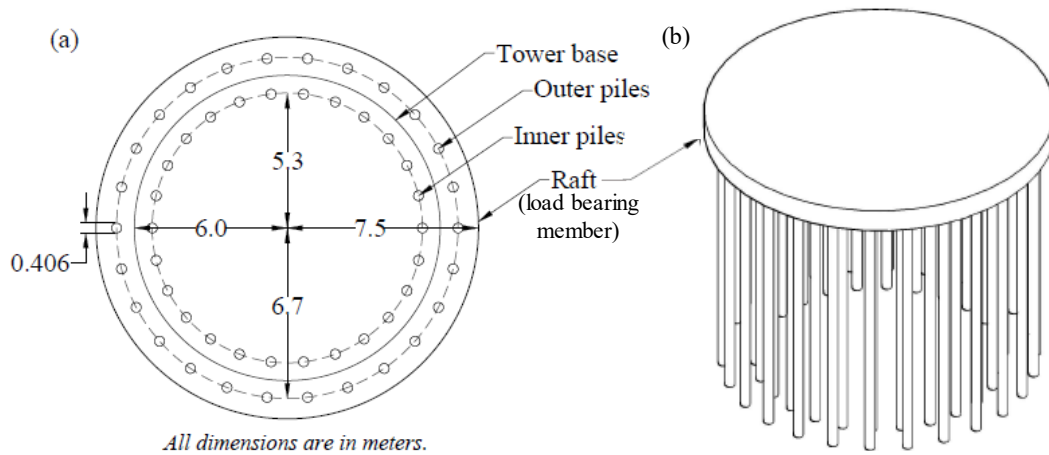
Final design of piled-raft foundation (a) Plan view and (b) 3D view (length of pile is not to scale)
